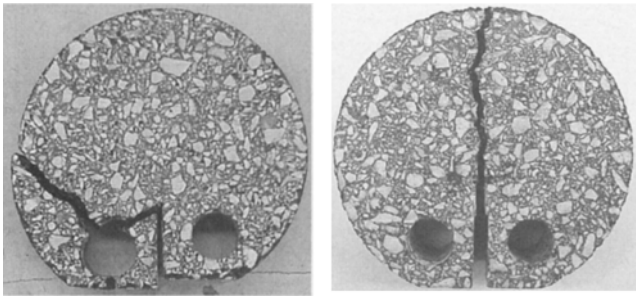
Crack growth in the initial and final specimen geometry (a) initial specimen geometry with failure at the loading points; (b) final specimen geometry with desirable fracture plane
